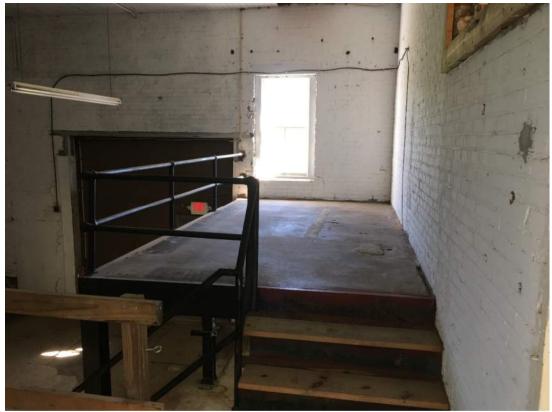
Upper Level North Room, Viewed from Southwest Corner to East Wall
